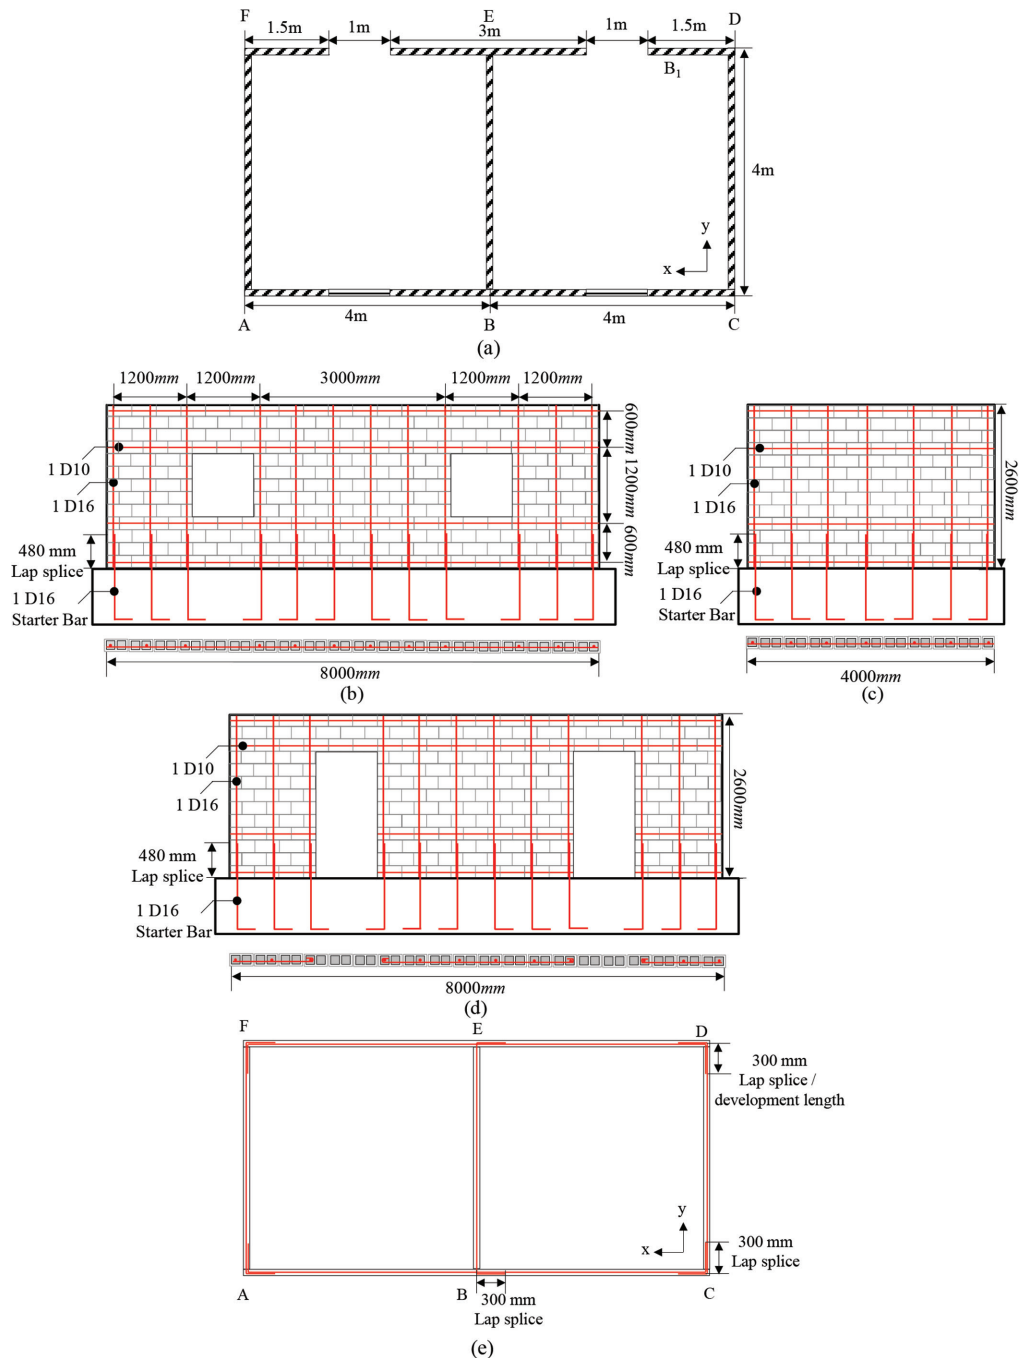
Configuration of prototype FGRM building: (a) wall layout; (b) wall AC; (c) walls CD, BE, and AF; (d) wall DF; and (e) horizontal reinforcement lap-splice and connection detail.
